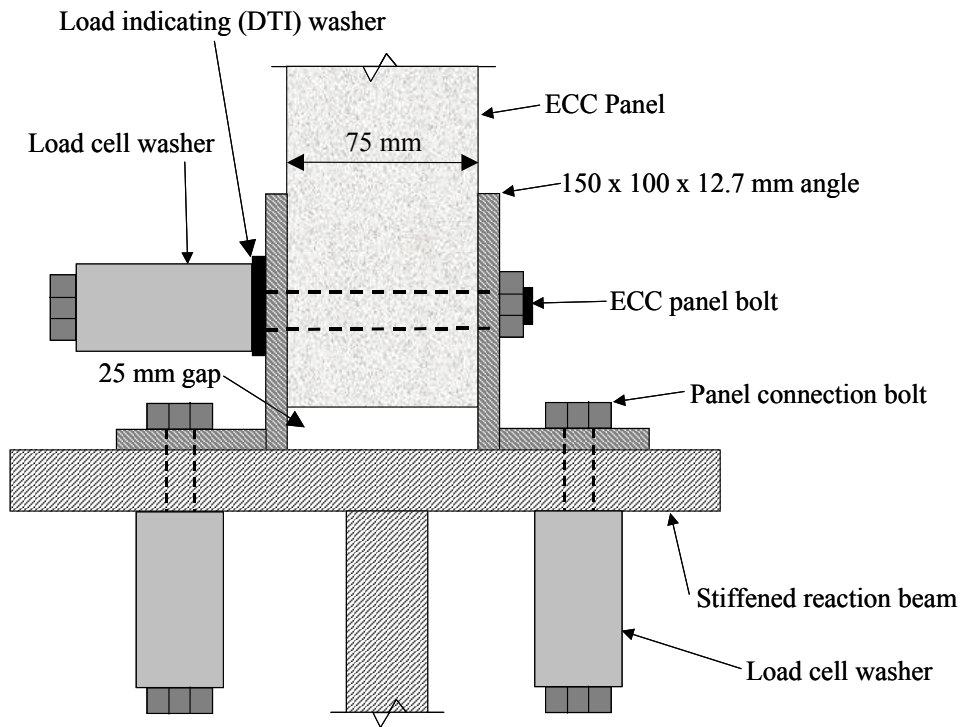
Cross-section of panel base. Reaction beam stiffeners not shown
